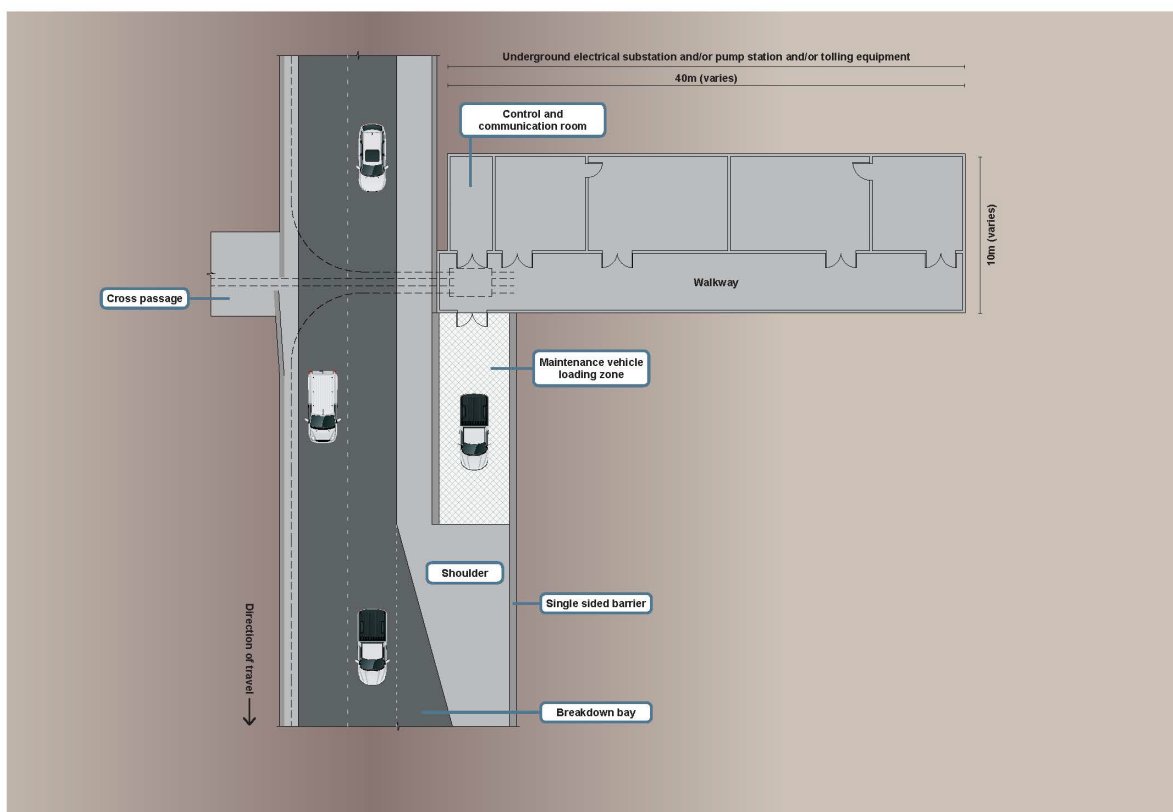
Indicative underground substation layout (EIS Figure 5-53)
